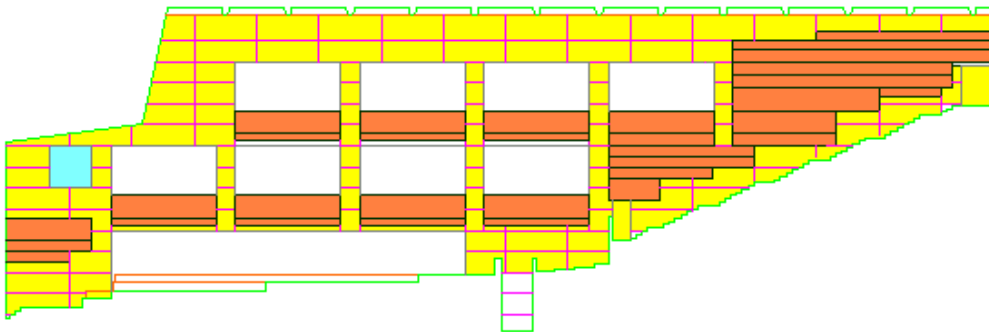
Sidewall elevation. Inclined walls are brown, vertical planes yellow, balconies white and windows blue.
